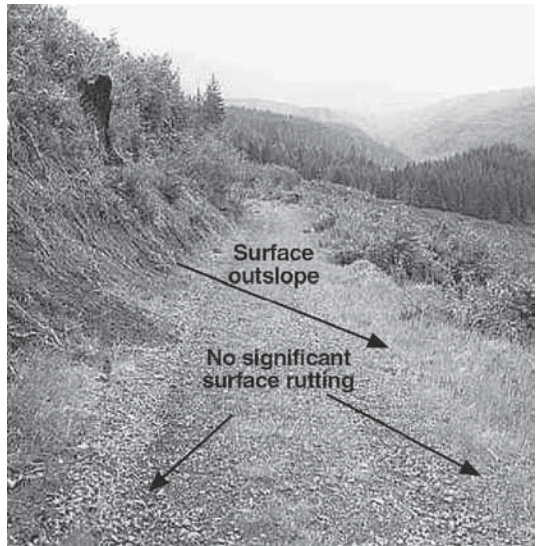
Outsloped road with minor cut-bank sloughing after above average rain storm event.
